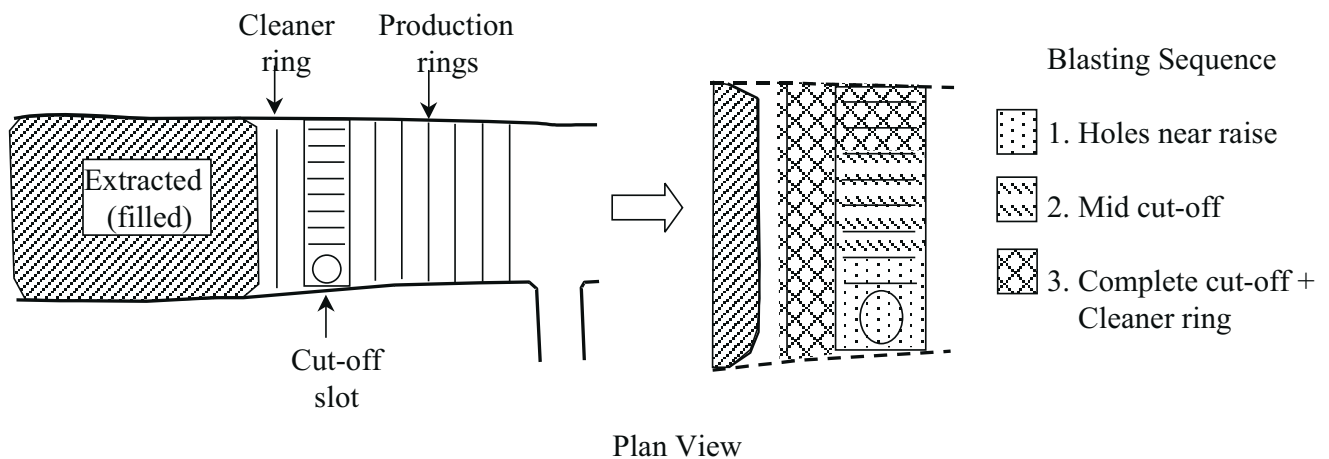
Cleaner ring geometry to minimise fill damage from blasting.
